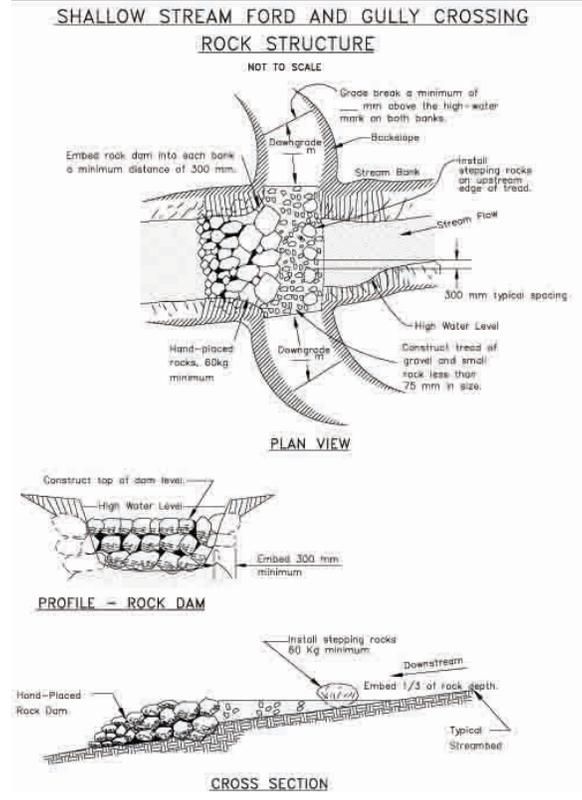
Typical Rock Ford Drawing and Cross-Section.
